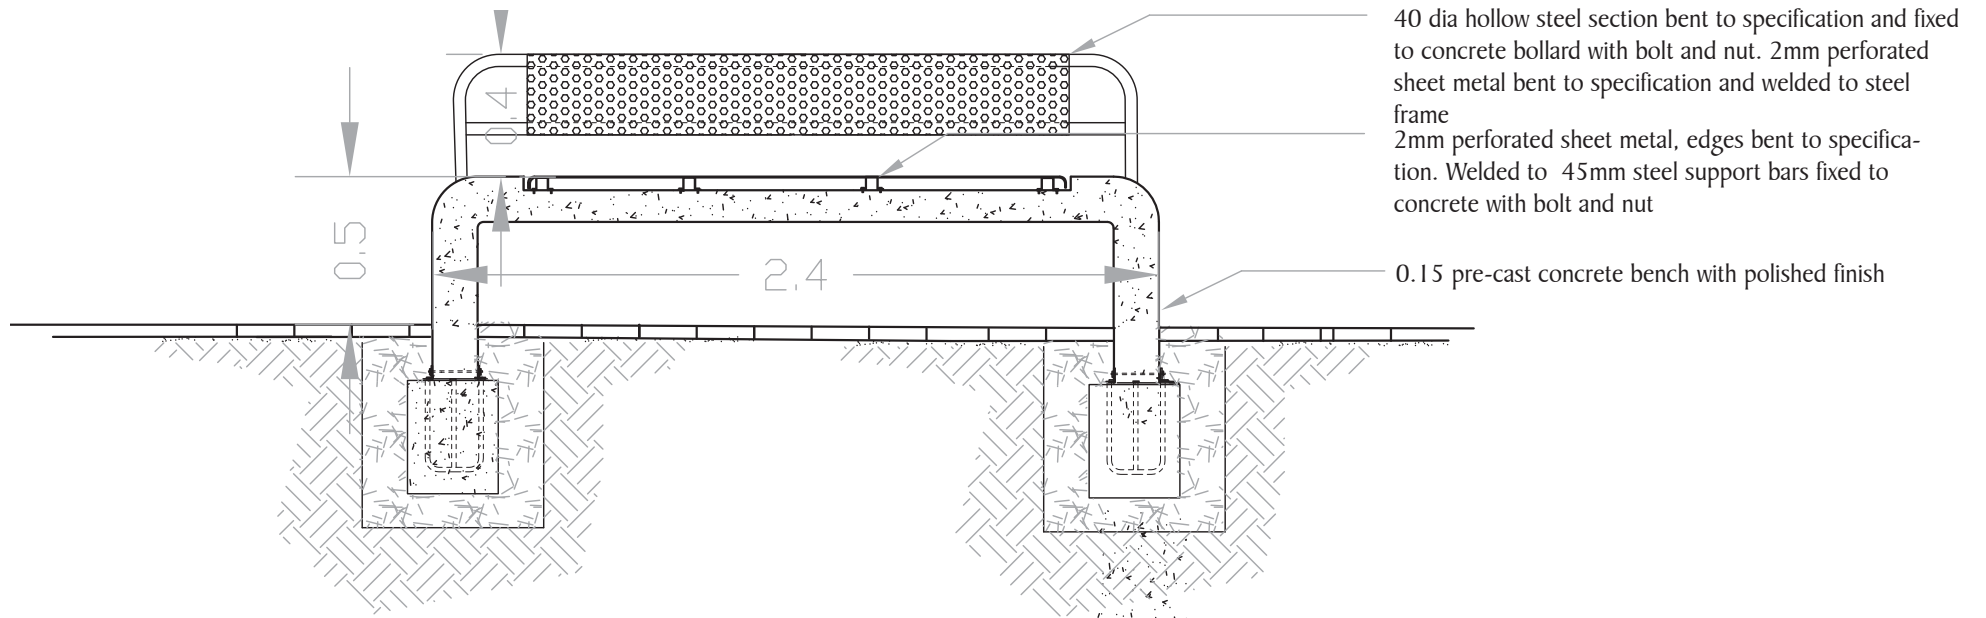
Bench with backrest Part elevation. Scale 1:25 (Author, 2008)
